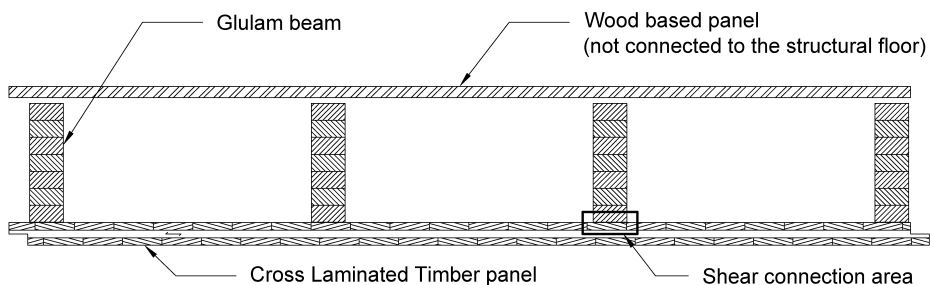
Example of a glulam-CLT cassette floor element with CLT panel located at the bottom.
